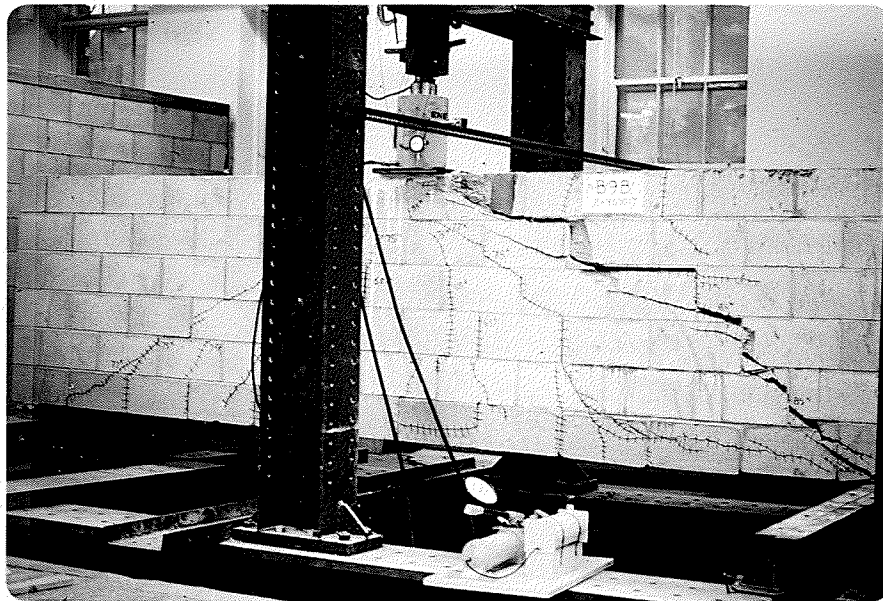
FLEXURAL SHEAR FAILURE IN BEAM 9B
